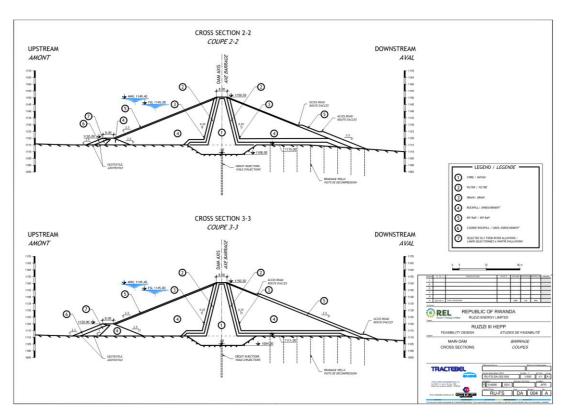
Dam Design Drawings: Cross Sections 2-2 and 3-3
